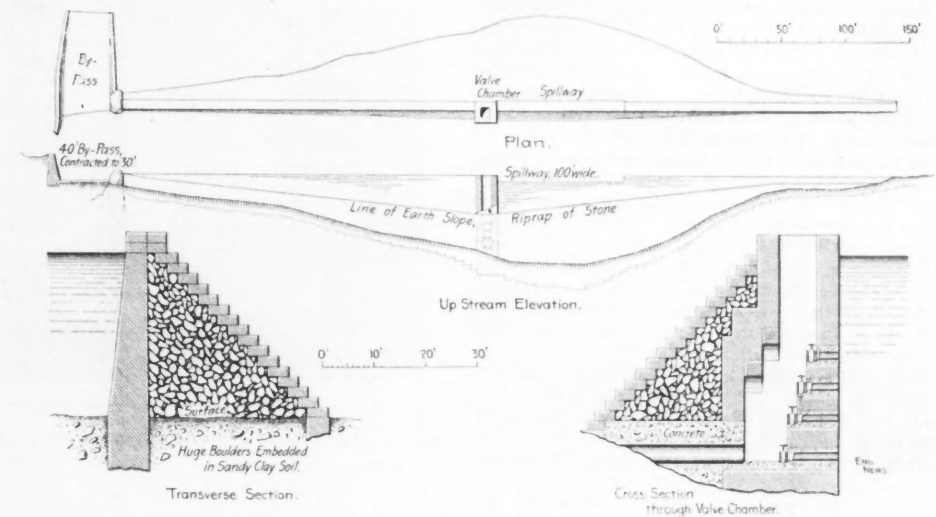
PLAN AND SECTION OF THE CASTLEWOOD ROCK-FILL DAM OF THE DENVER LAND & WATER CO.
